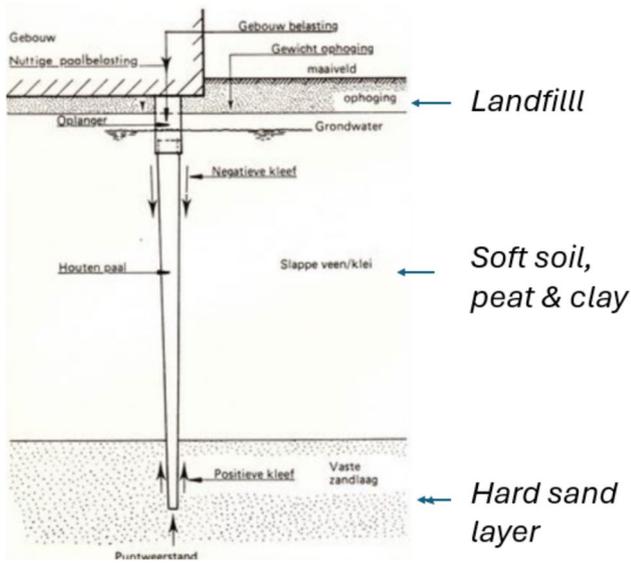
End Bearing Pile foundation on soft soil (Funderingen op palen, <https://berkela.home.xs4all.nl>)
